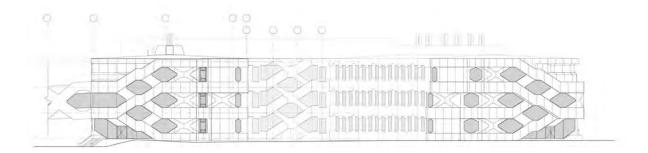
East Elevation (ArchDaily 2012)
